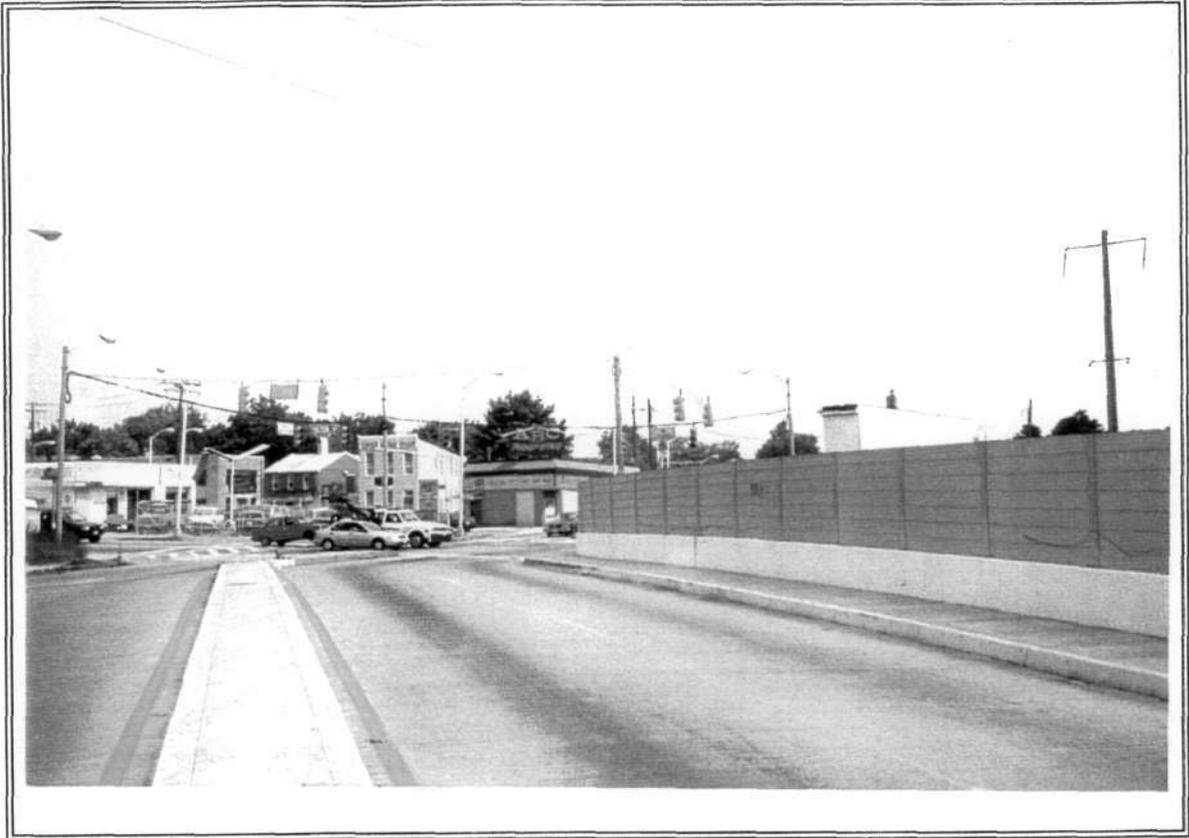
View toward the bridge from Hilton Street, looking northwest (#27)
